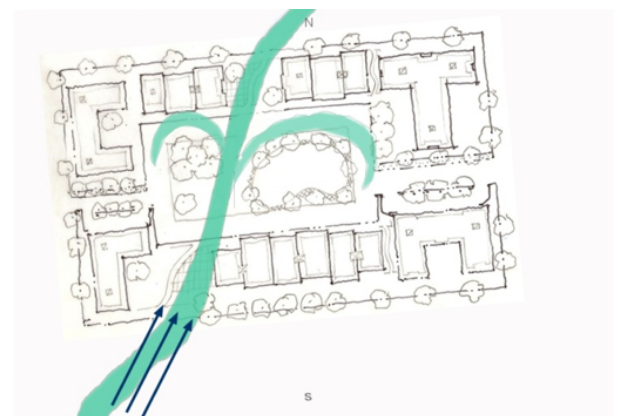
Configuring vegetation and buildings to direct desirable summer air flows; cross-ventilation through dual-aspect buildings, Raven (2010).
